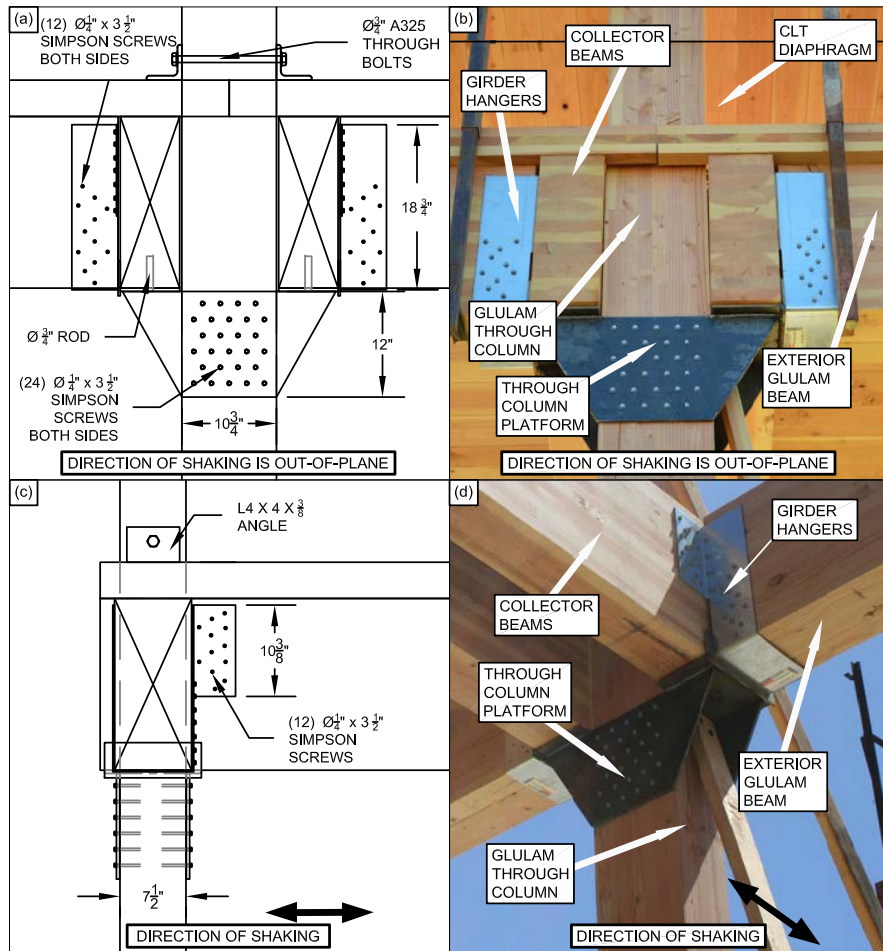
Gravity frame connection joint 3 (a) exterior view schematic (b) exterior view photo (c) side view schematic (d) side view photo
